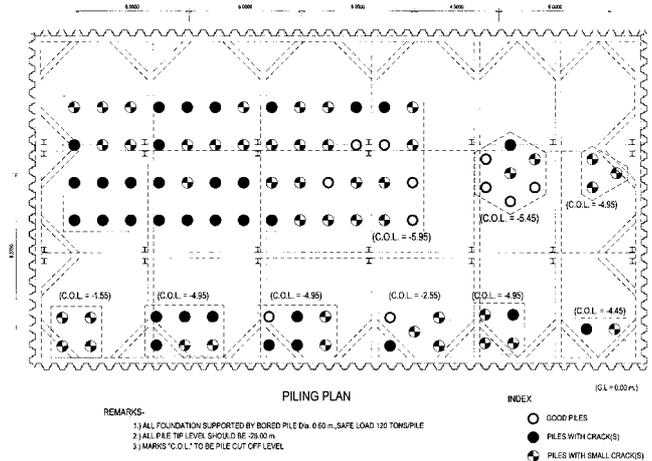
Plan of Excavation and Location of Damaged Piles (a Portion of Project Area) Case IV
